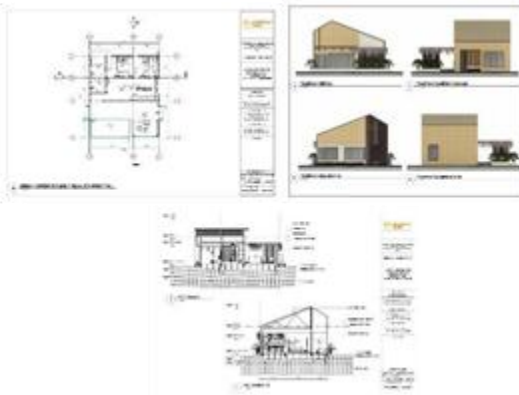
Floor Plan, View, and Section of Superior Family Villa 2BR with Pool
